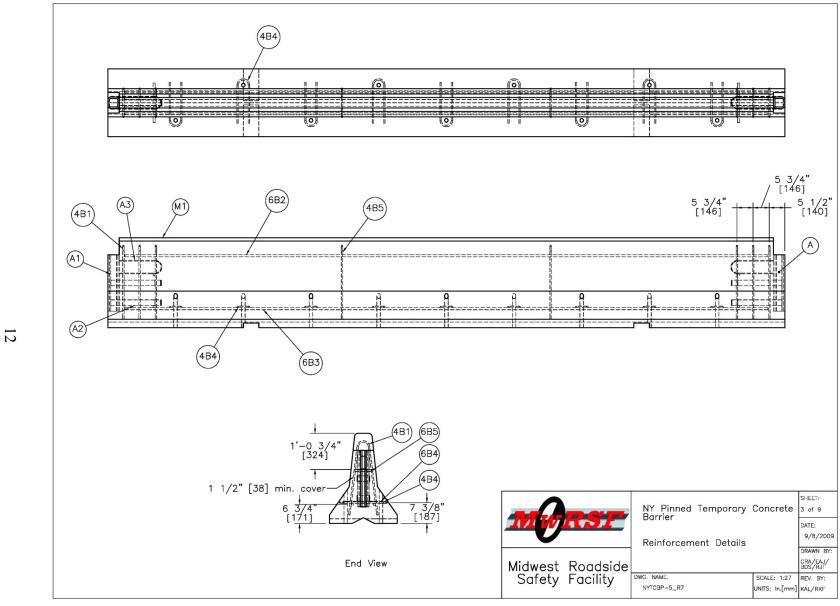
Temporary Concrete Barrier Reinforcement Details, Test No. NYTCB-5
